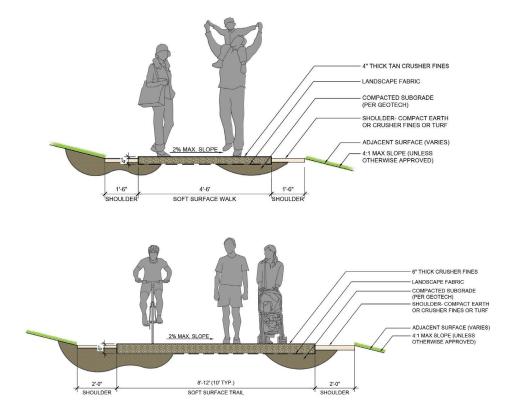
Concept Existing or Non-Paved Surface Trail Sections
